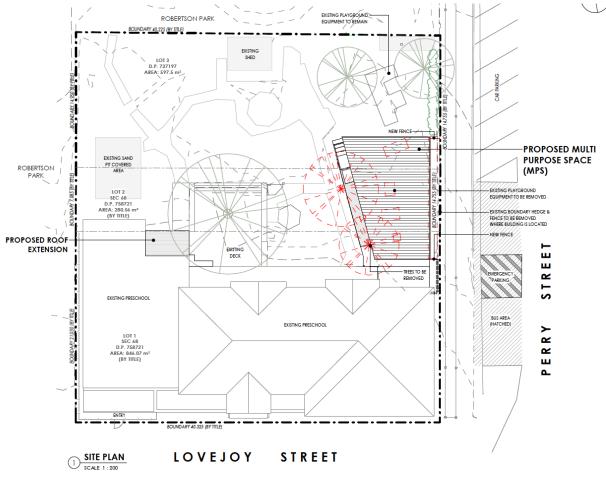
LAYOUT (SUNRAI DESIGNS)
